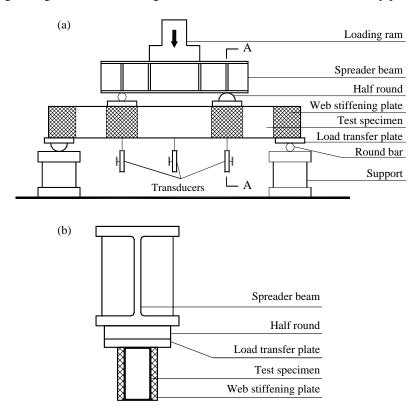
Schematic views of bending test arrangement: (a) elevation; (b) section A-A.
